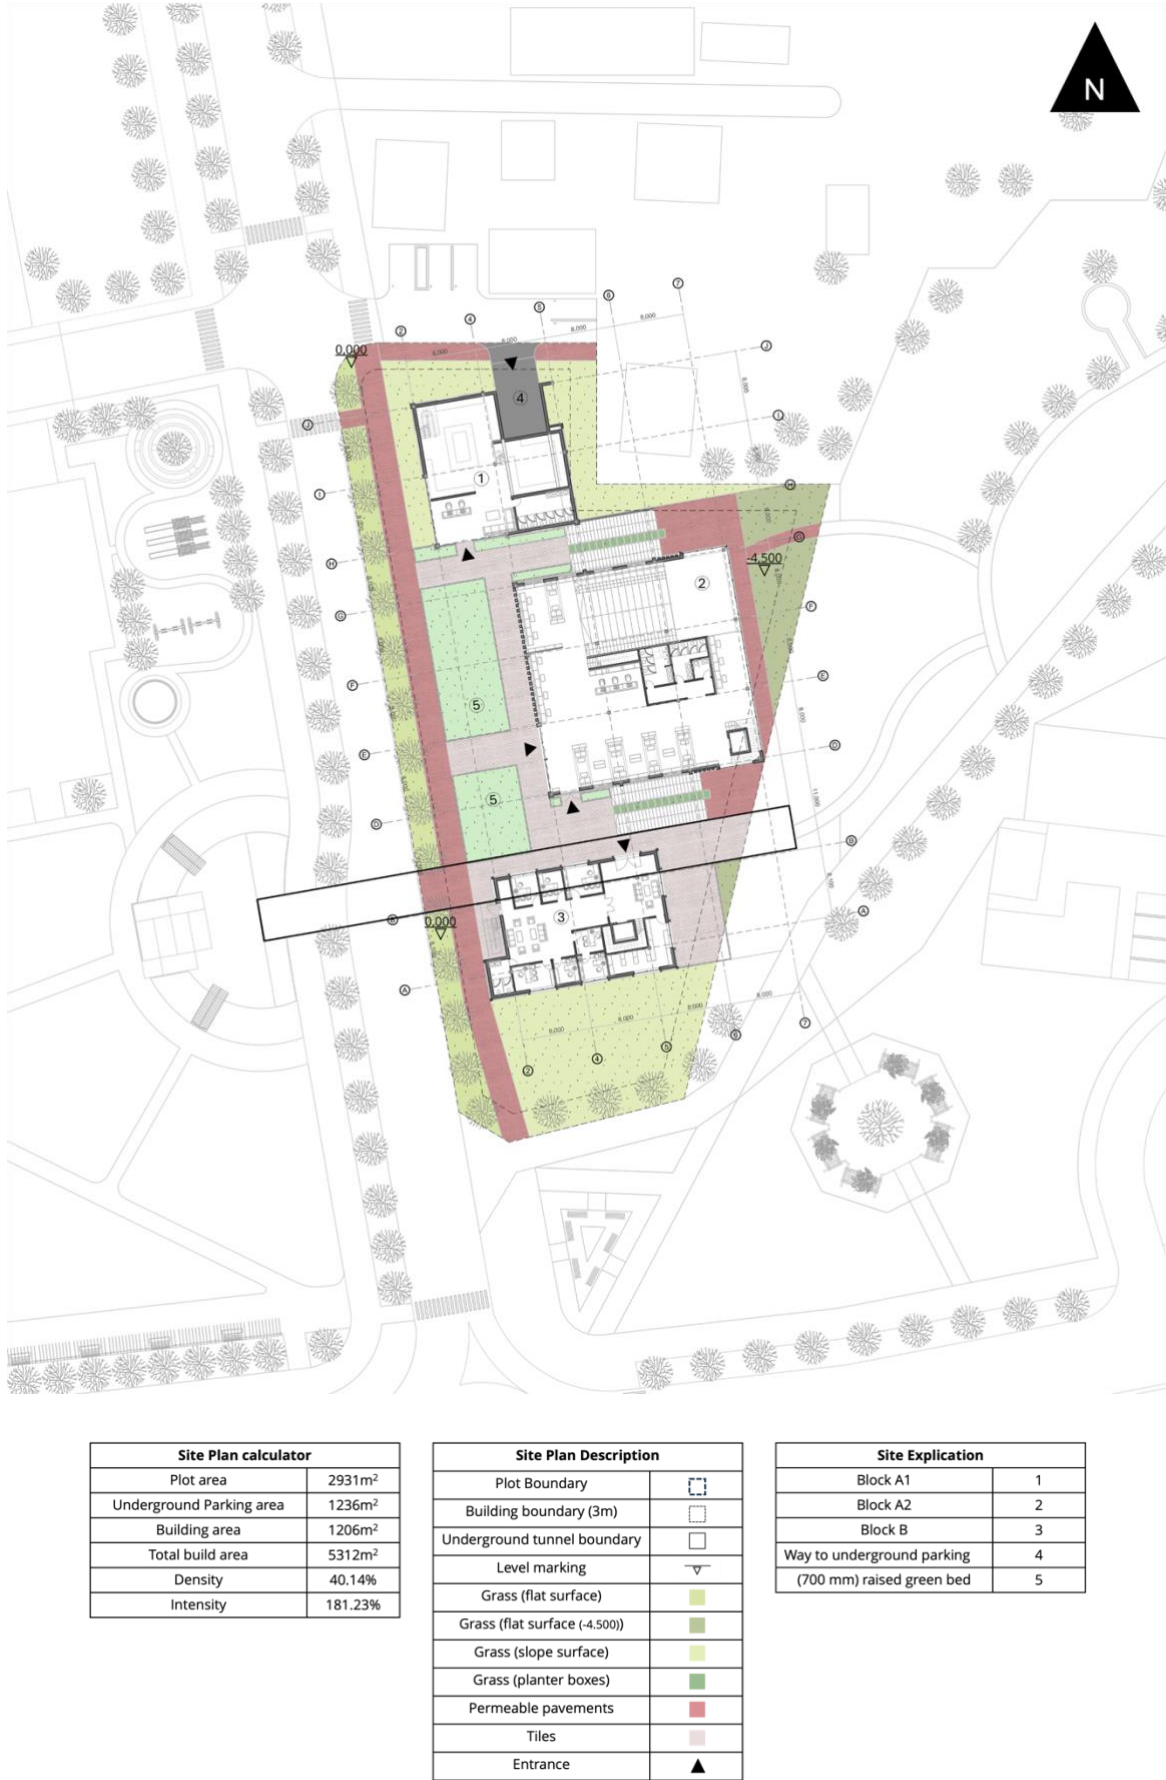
The multifunctional public library site plan (not in scale) by the author.
